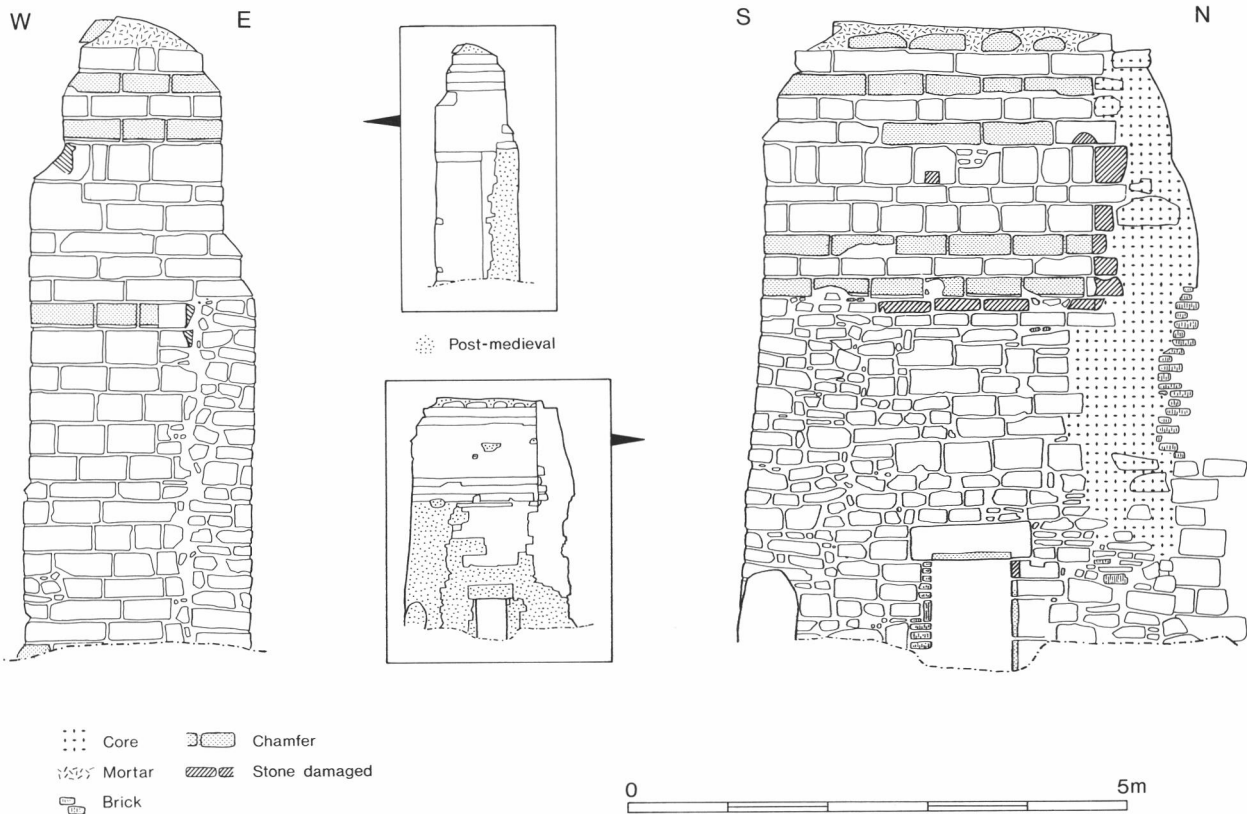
Dale Abbey. Area V: elevation of the standing chimney [AFA], incorporated into the south-east corner of Abbey House. Core and damaged stonework of the eastern elevation indicate the junction with the south wall of the South Range.
